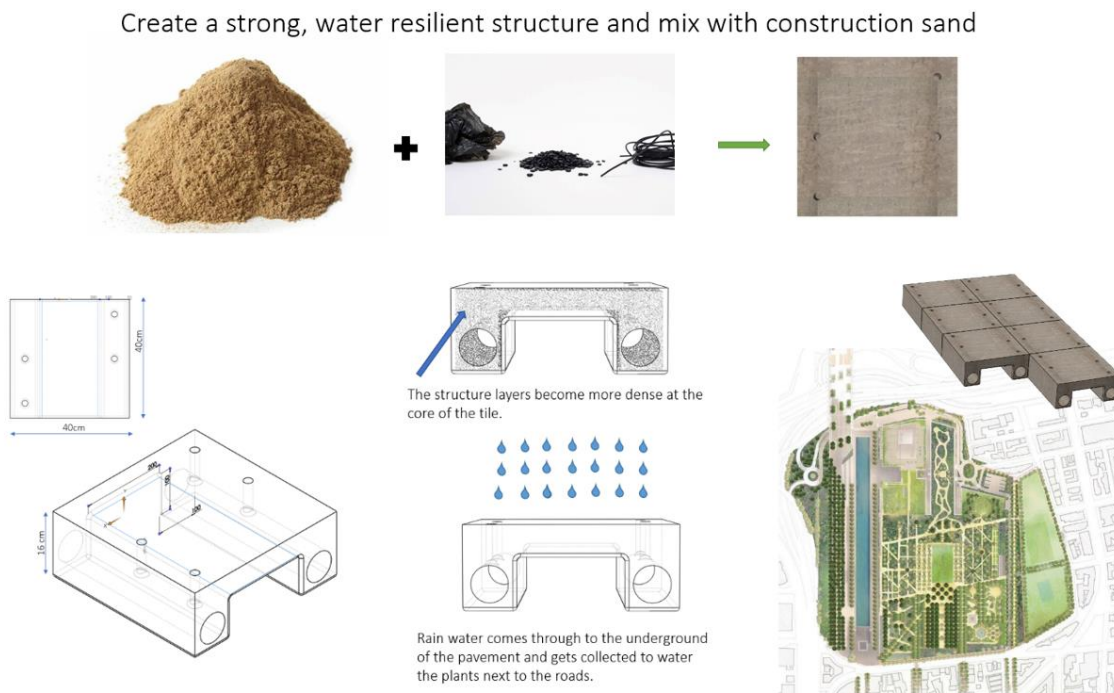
The LARVTile, an outdoor pavement tile made from recycled plastics and recycled construction sand. It is suggested as solution to rainwater management of urban-planted landscapes. Original concept, created in SOLIDWORKS and supported by Blue Cycle Lab, Aikaterini Laskaridis Foundation.
